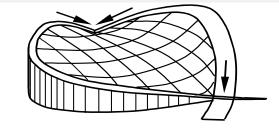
Suspension roof with parallel suspension cables, supported by crossed arches.
